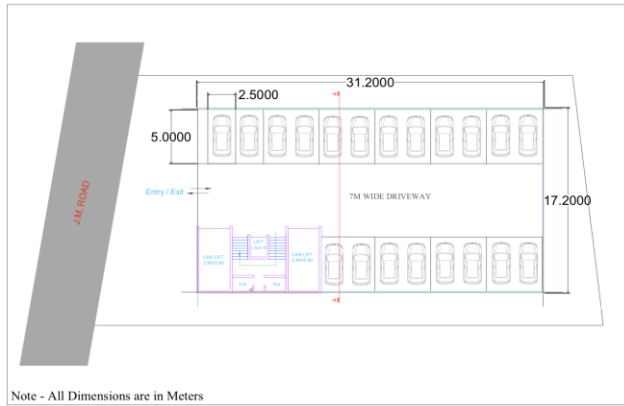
Remaining Floors and Terrace For Four Wheeler Parking
